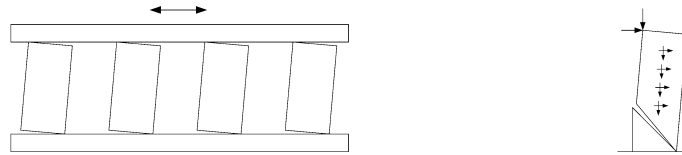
Generic configuration under alternate horizontal actions: masonry wall (left) and cracked wall pier (right).
